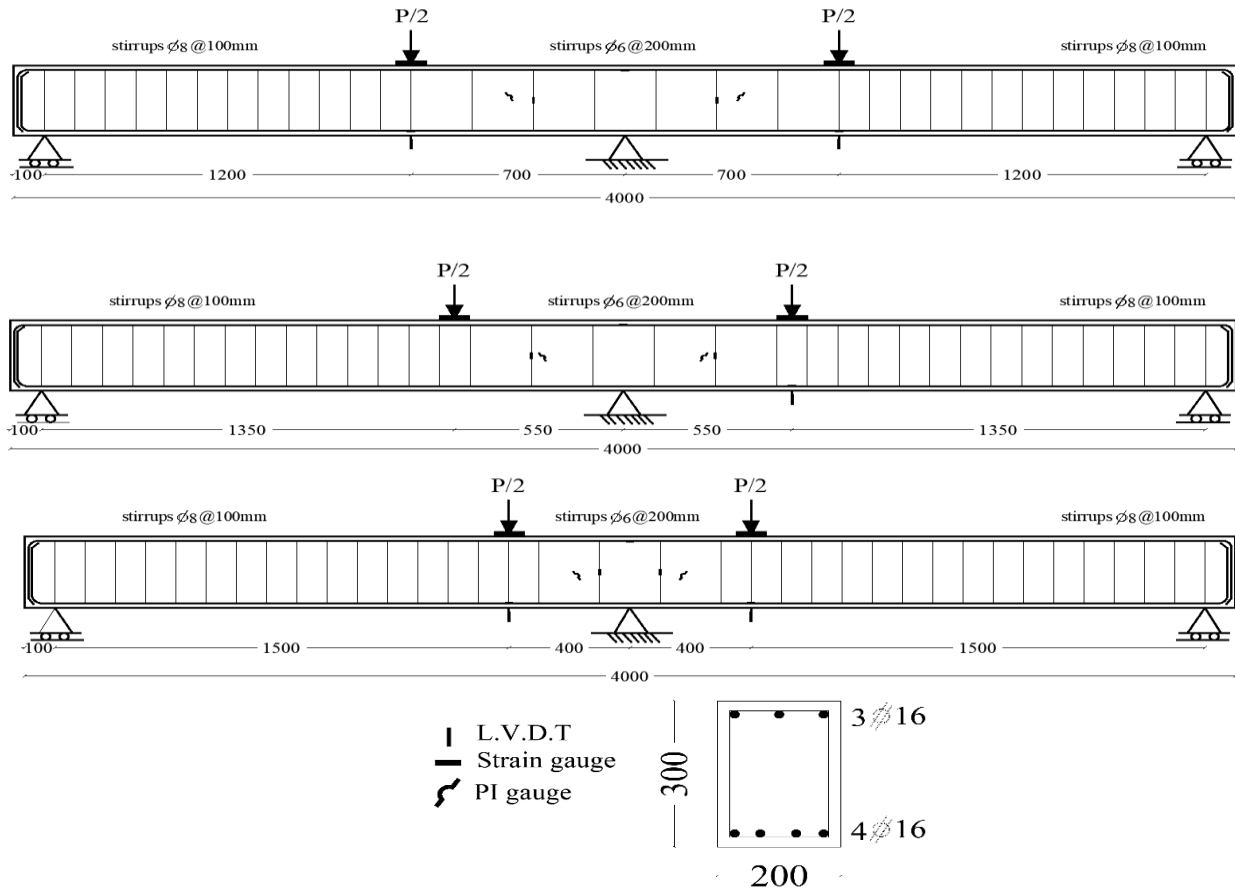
Details of reinforcement of tested beams, typical cross-section.
